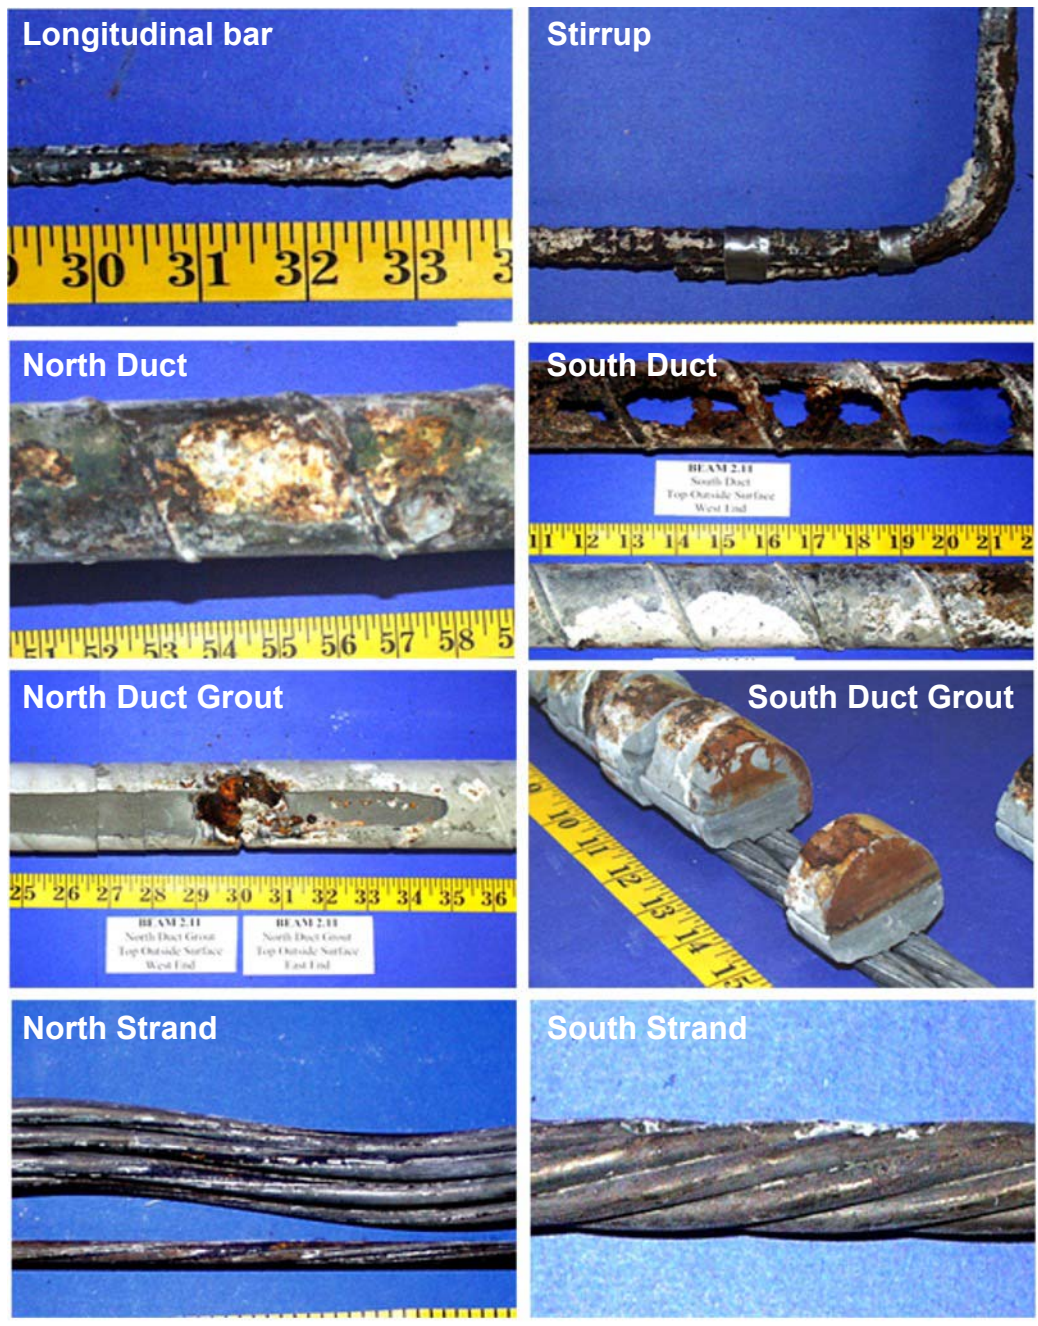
Specimen 2.11 – Reinforcing Elements
